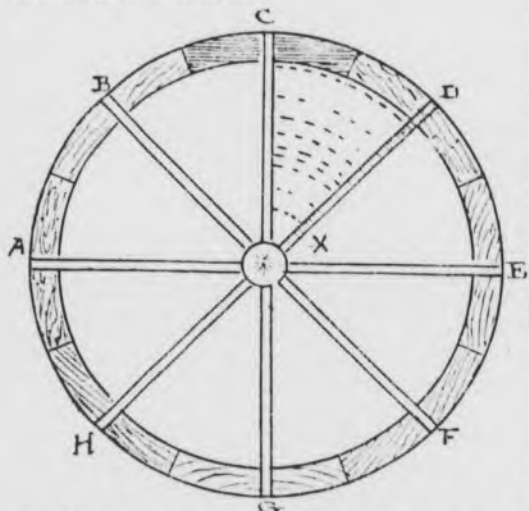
PLAN OF PLATE, RAFTERS &amp; SWEEP.
